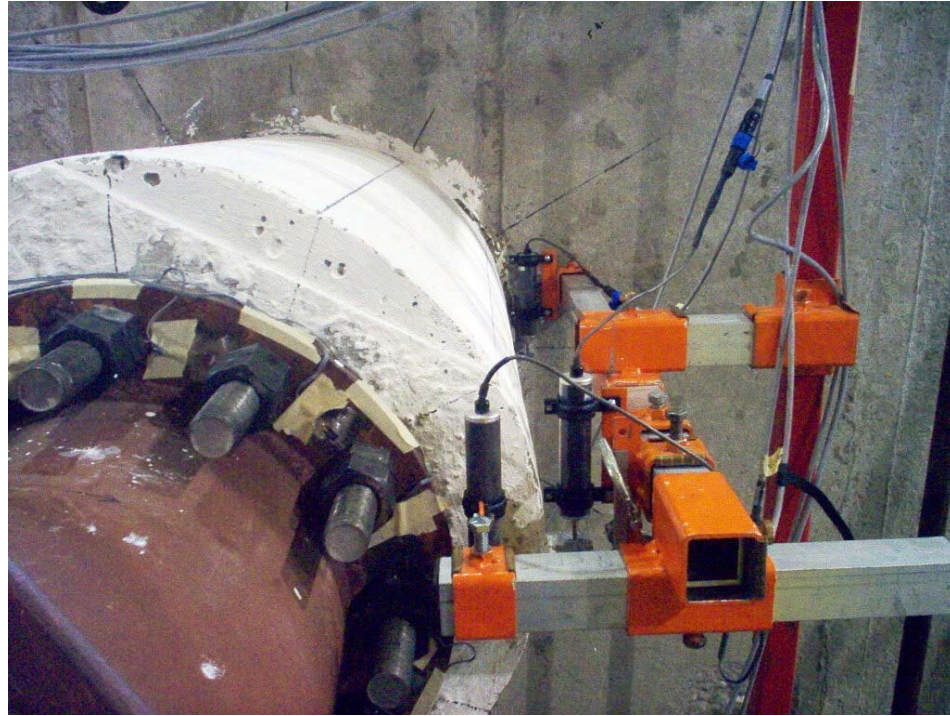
Location of LVDTs D1V, D4, and D7 on the test specimen.
